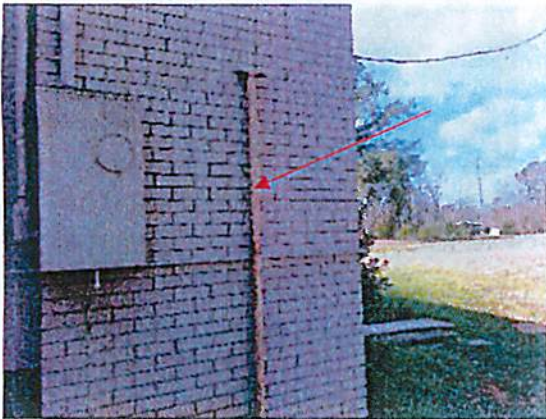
View of a heating/fuel oil tank vent on the exterior of the boiler room.
